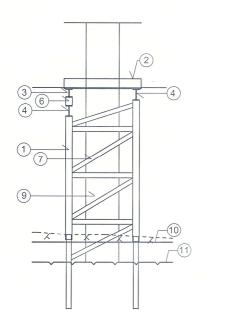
Middle wall. Drilled steel piles. Steel beams and jacking system. Bracing.
